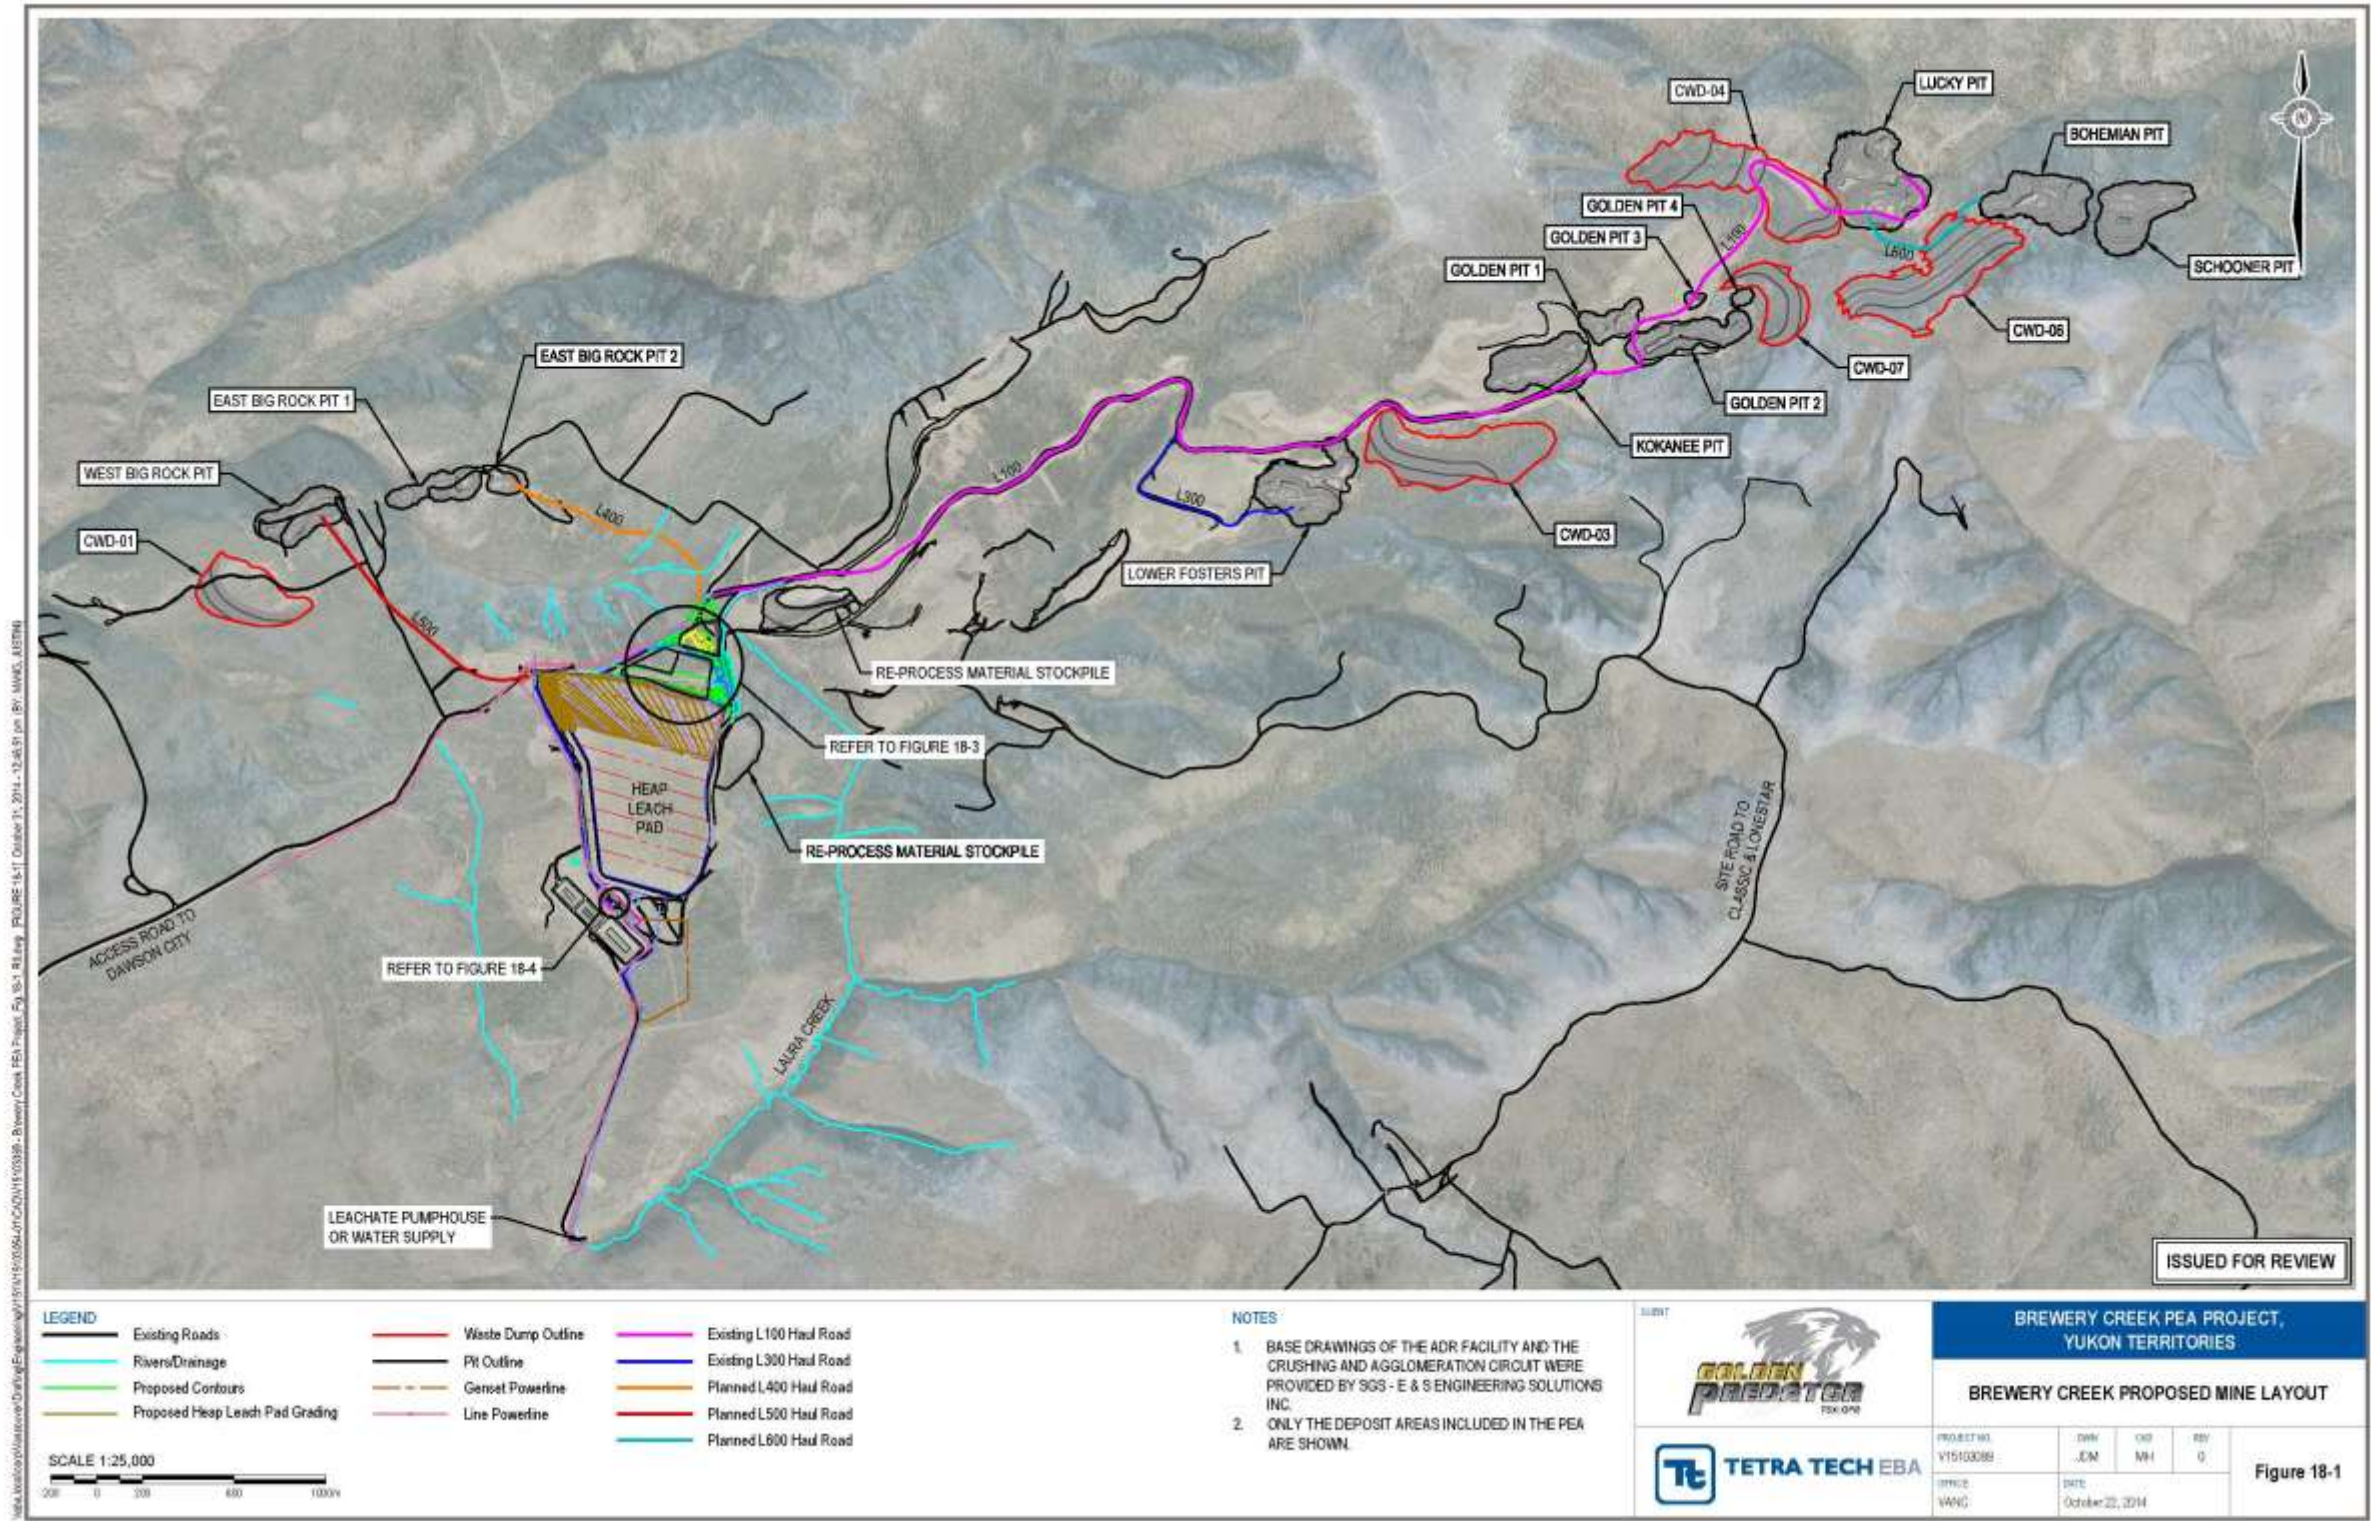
Brewery Creek Site Plan Showing Haul roads and pit locations
